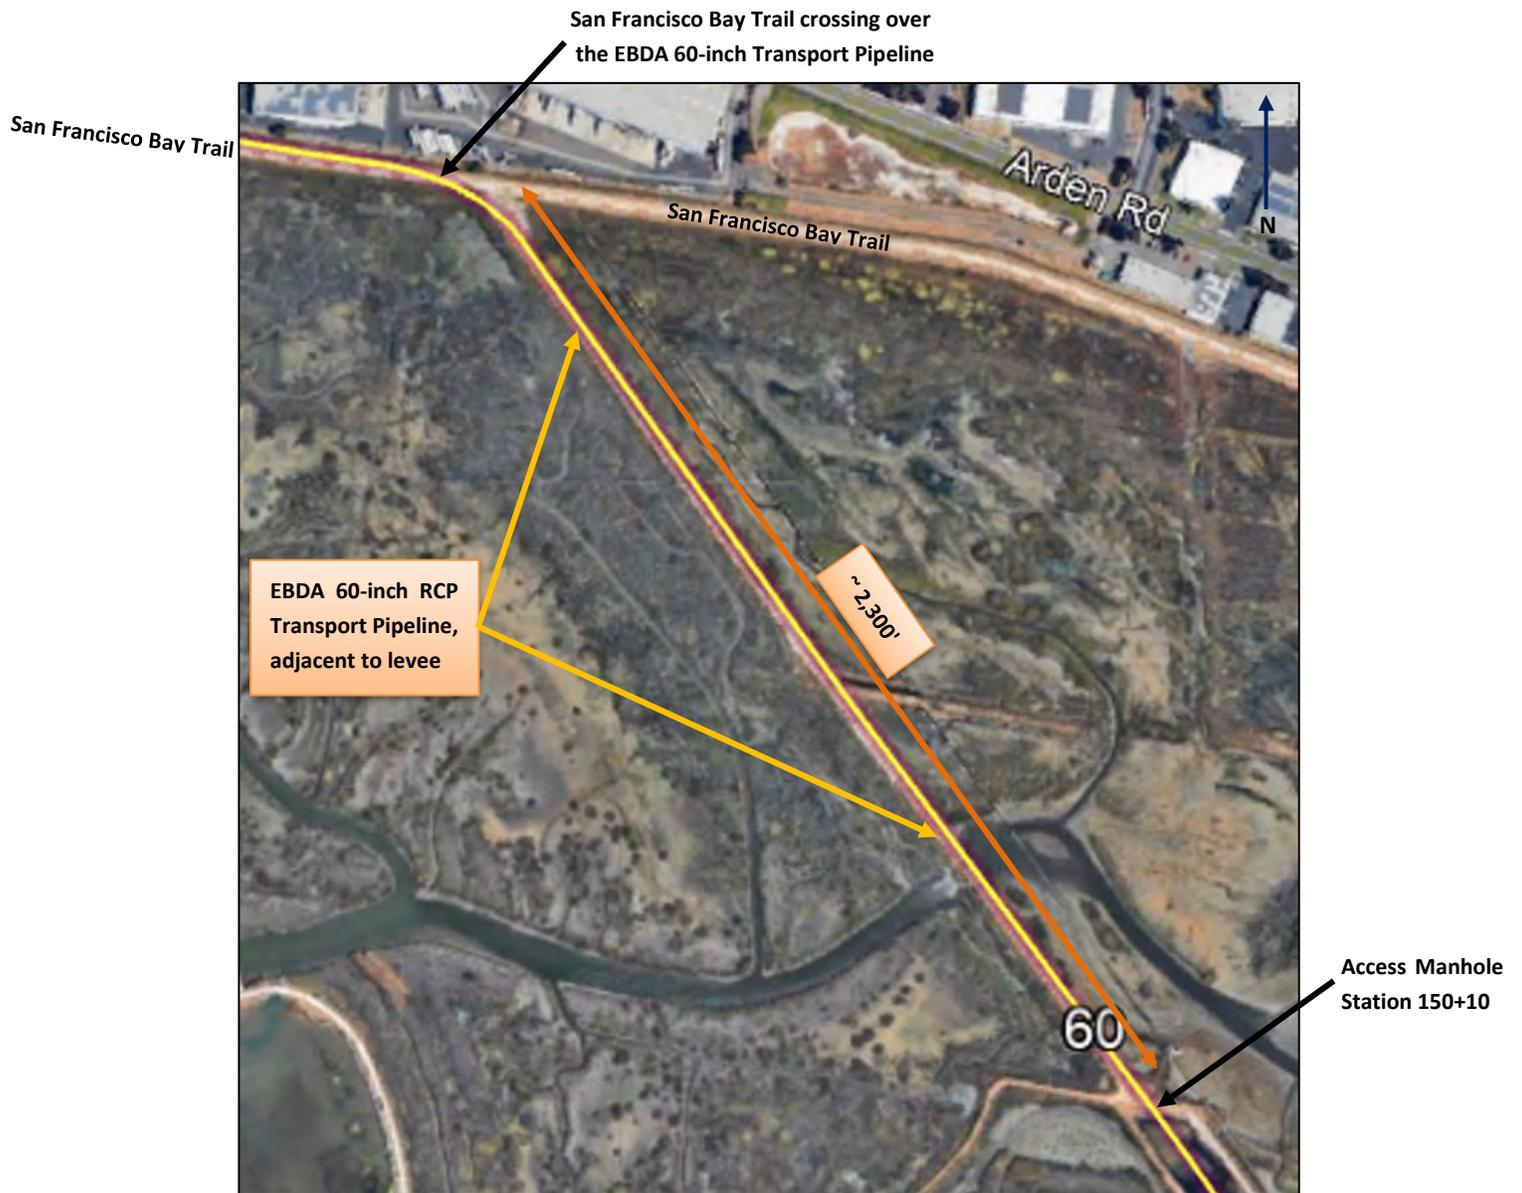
EBDA 60-inch Transport Pipeline alignment adjacent and parallel to the existing levee between the San Francisco Bay Trail and EBDA Access Manhole at Station 150+10. See Figure A-6 for profile of San Francisco Bay Trail crossing.
